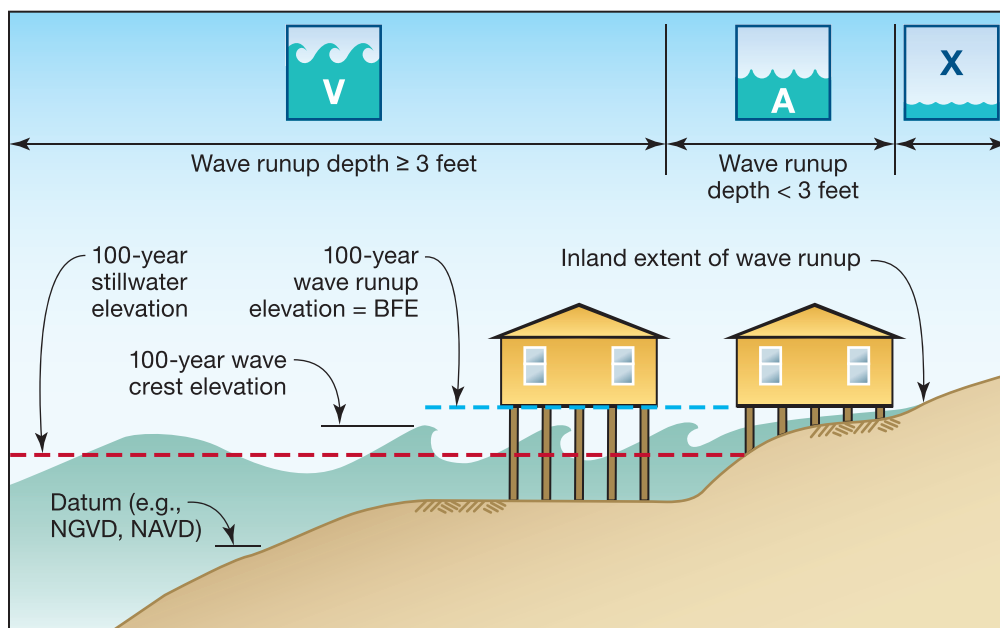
Where wave runup elevations exceed wave crest elevations, the BFE is equal to the runup elevation
